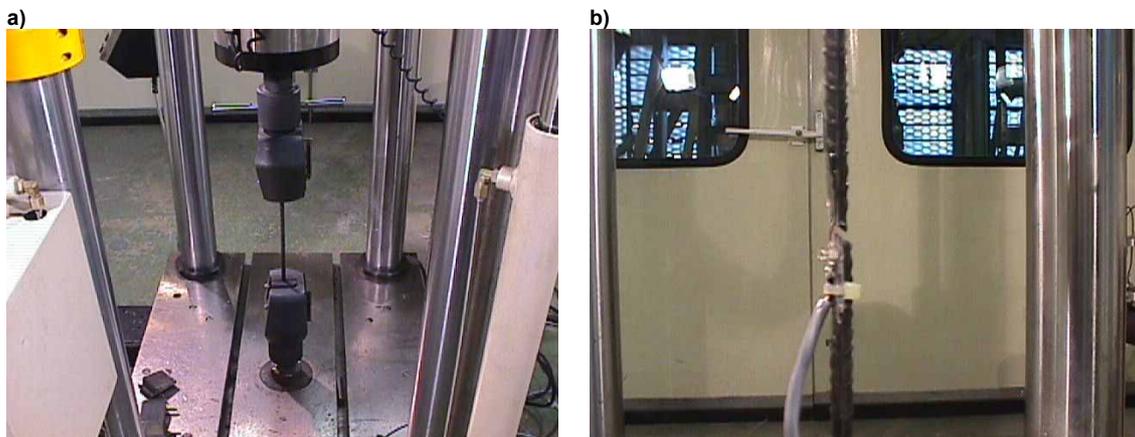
Reinforcement steel properties. a) Tension test; b) Detail of the failure of a reinforcing bar.
